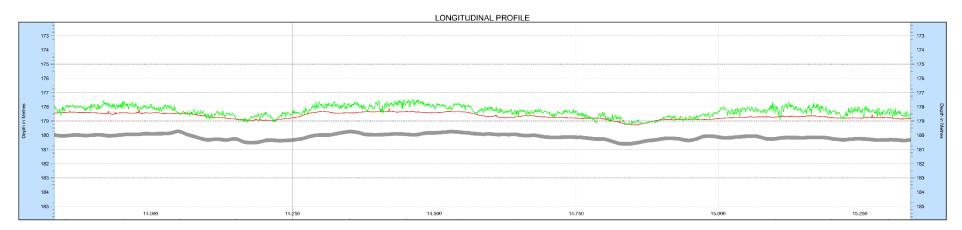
PL4556 As-built alignment sheet KP13.830 to KP15.340
